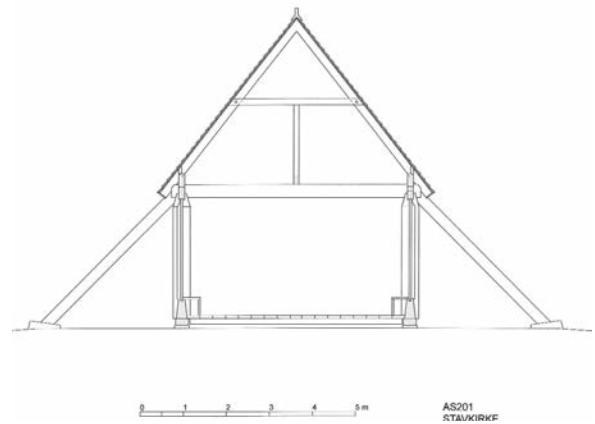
Trondenes Almenning; stave church reconstruction of 2016, cross section (drawing Gisle Jakhelln)
